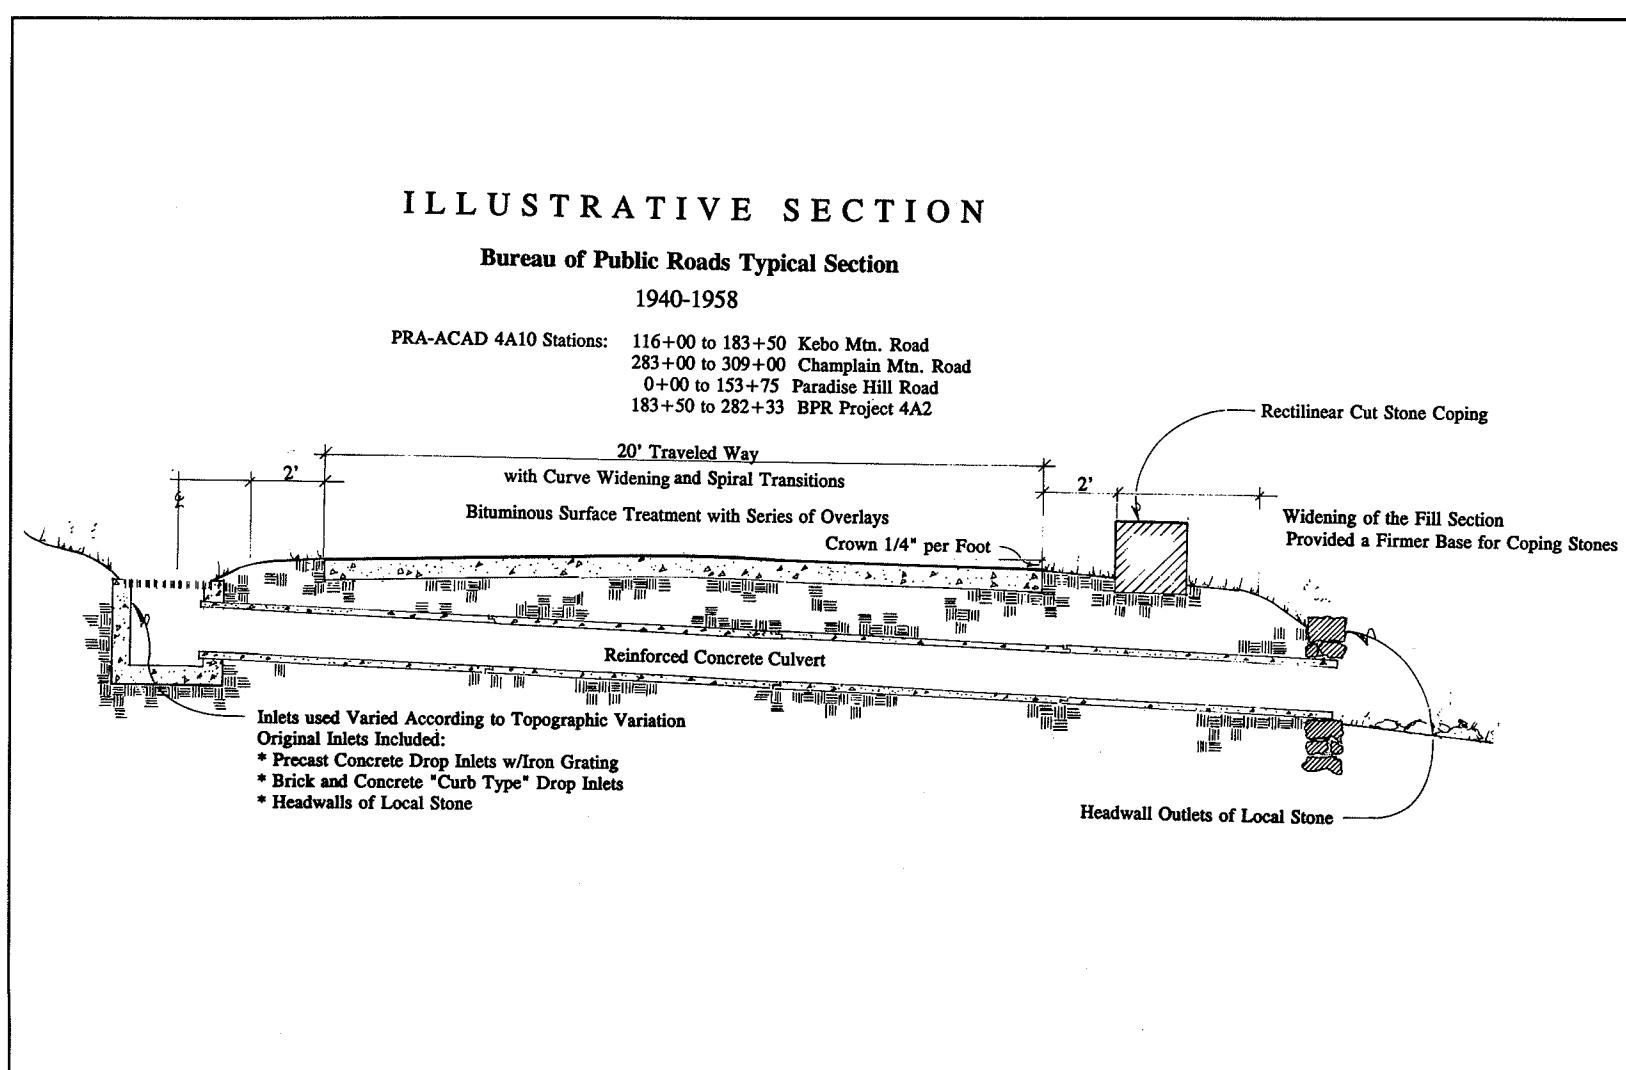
Illustrative cross-section, post-1940 construction. Drawing by OCLP.
